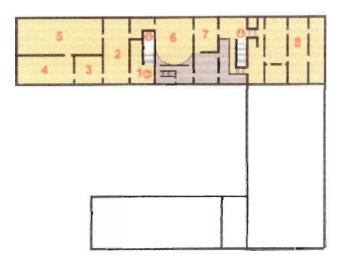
Floorplan of the 2nd floor of the Palazzo Ducale
